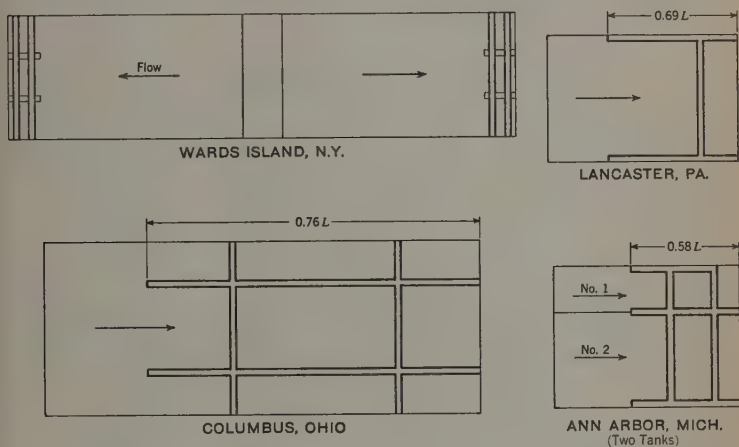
TYPICAL ARRANGEMENTS OF EFFLUENT WEIRS IN RECTANGULAR FINAL SETTLING TANKS
